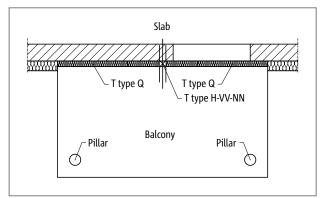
Schöck Isokorb® T type H: Balcony with column support
